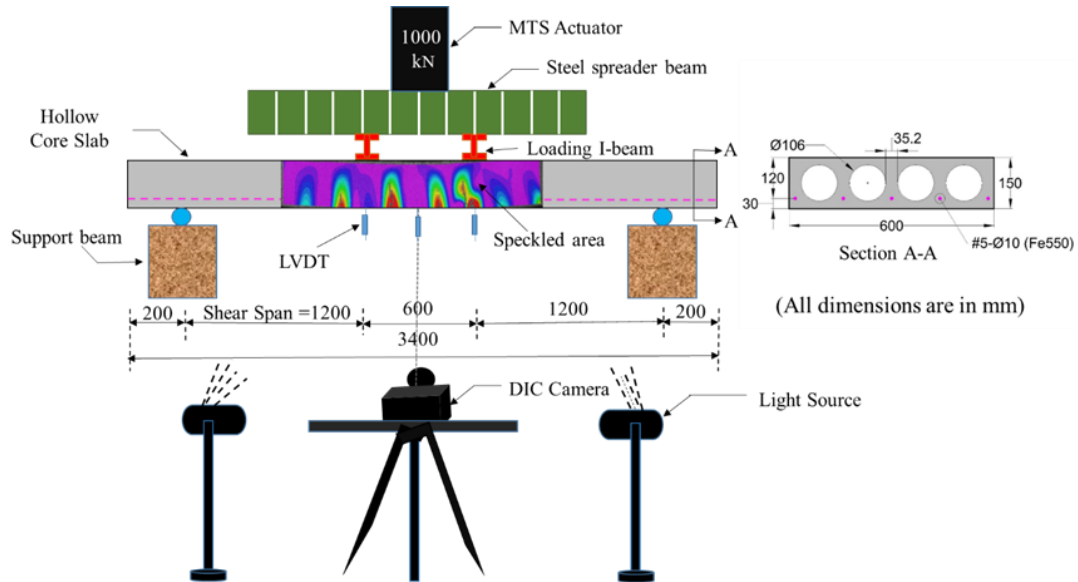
Geometrical configuration and test setup of the tested HCS and its cross-section
